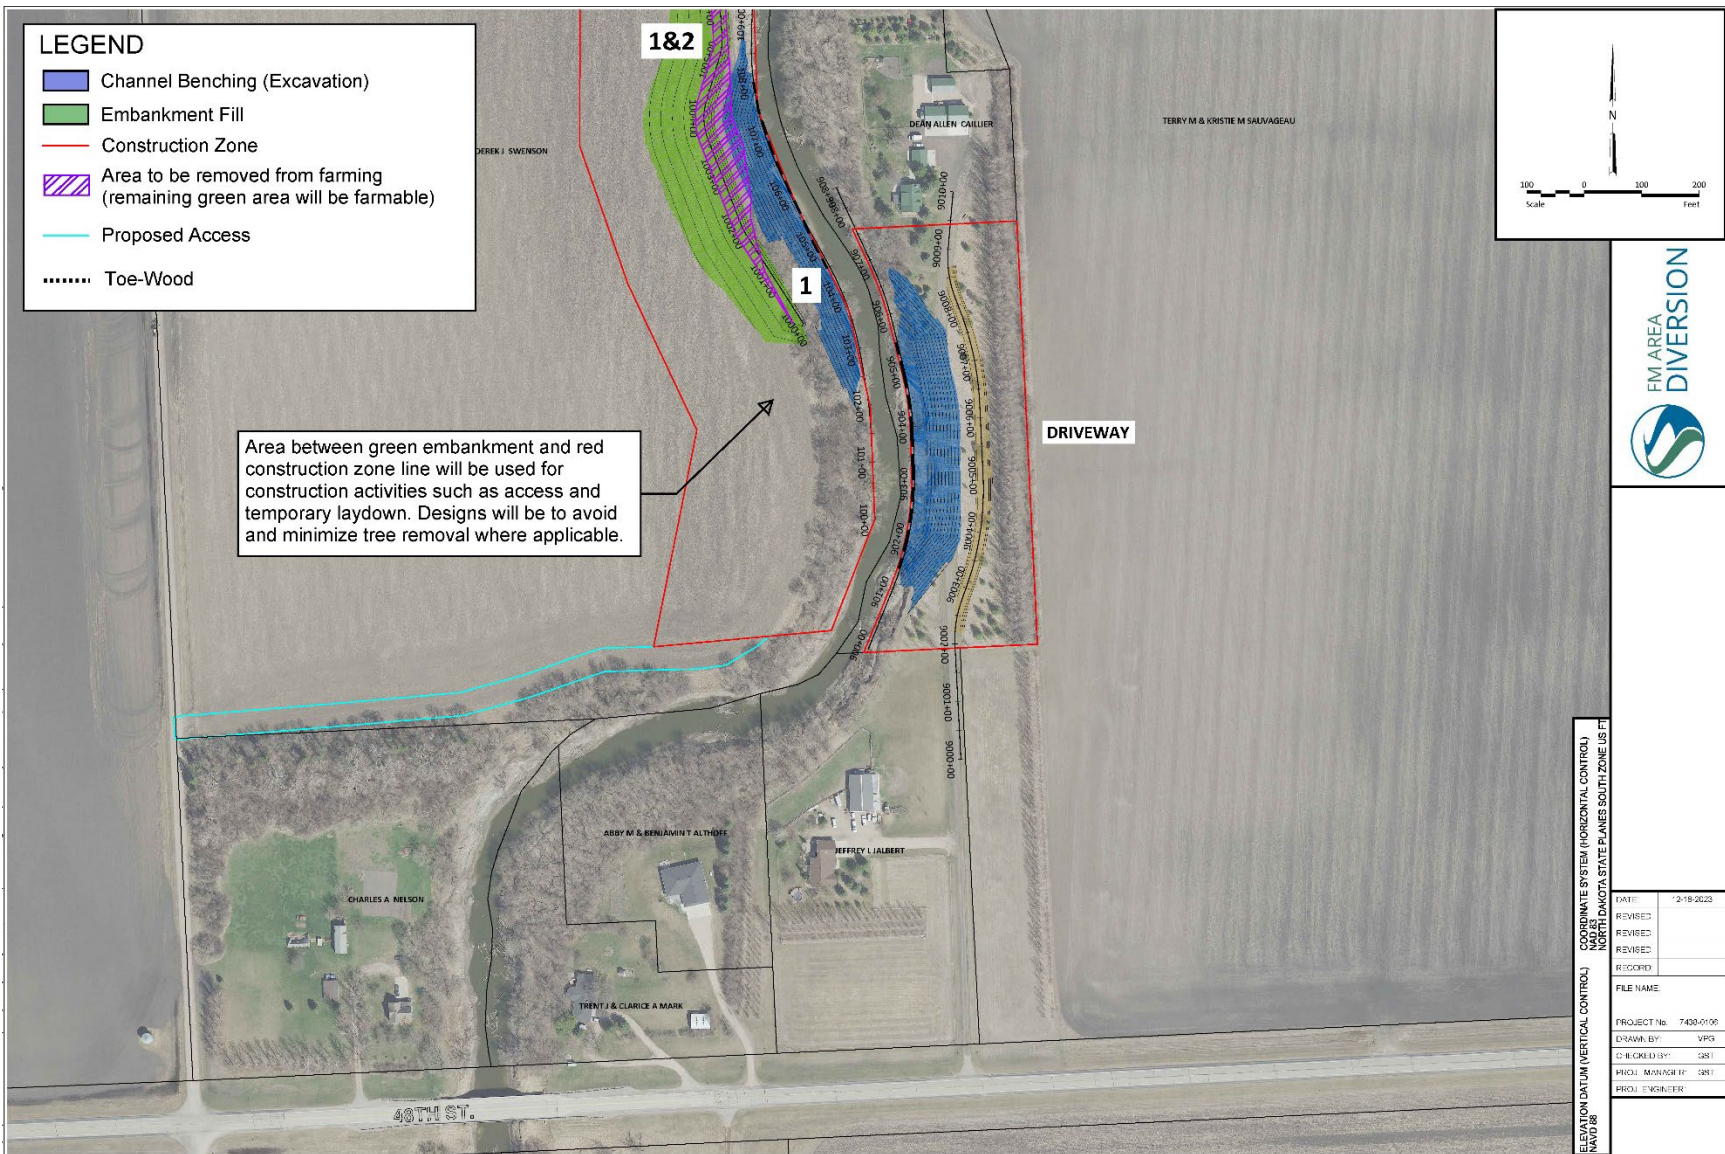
Sheyenne River Proposed Alternative Benching Detail (Figure 4 of 4)
